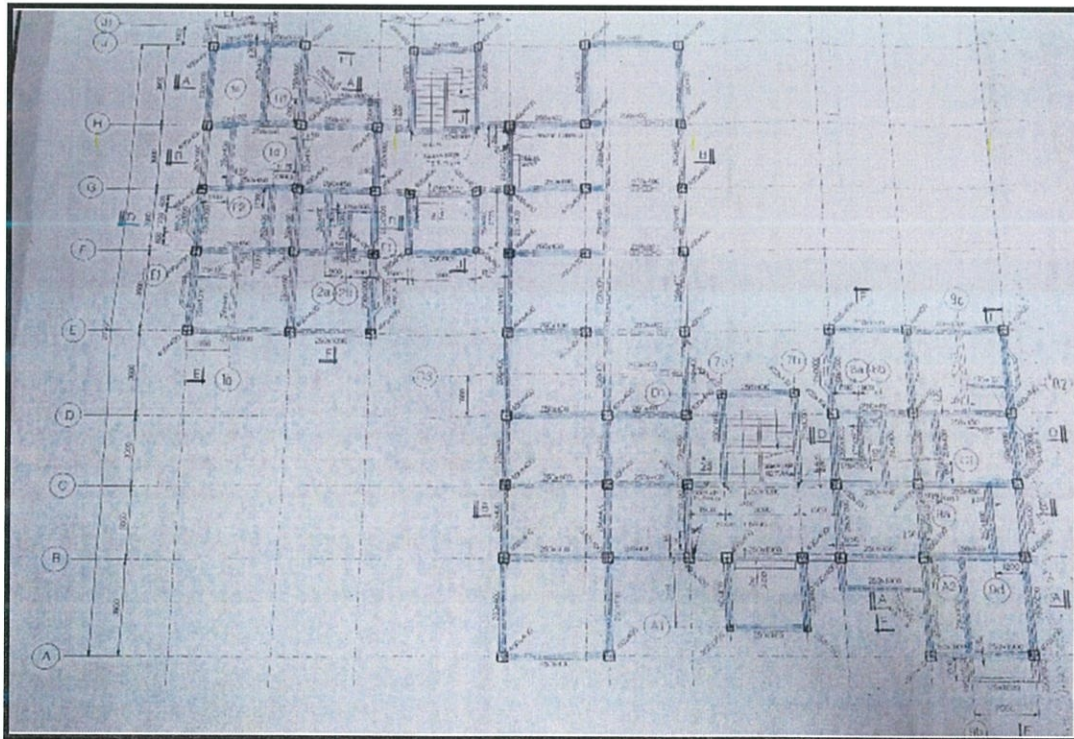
Shows the floor plan of in-situ beam at quarters building
